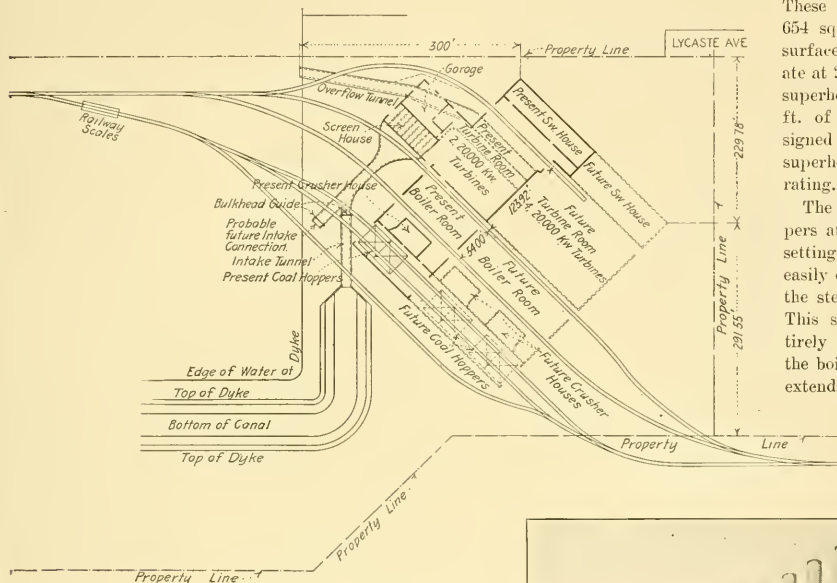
PLAN OF SITE OF THE NEW POWER HOUSE
